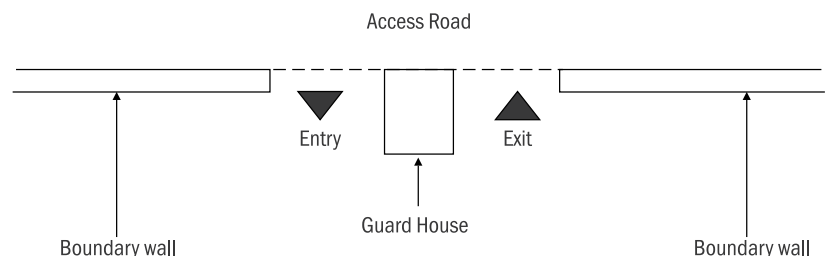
Plan Showing Entry/Exit Gate Abutting Main Road.
